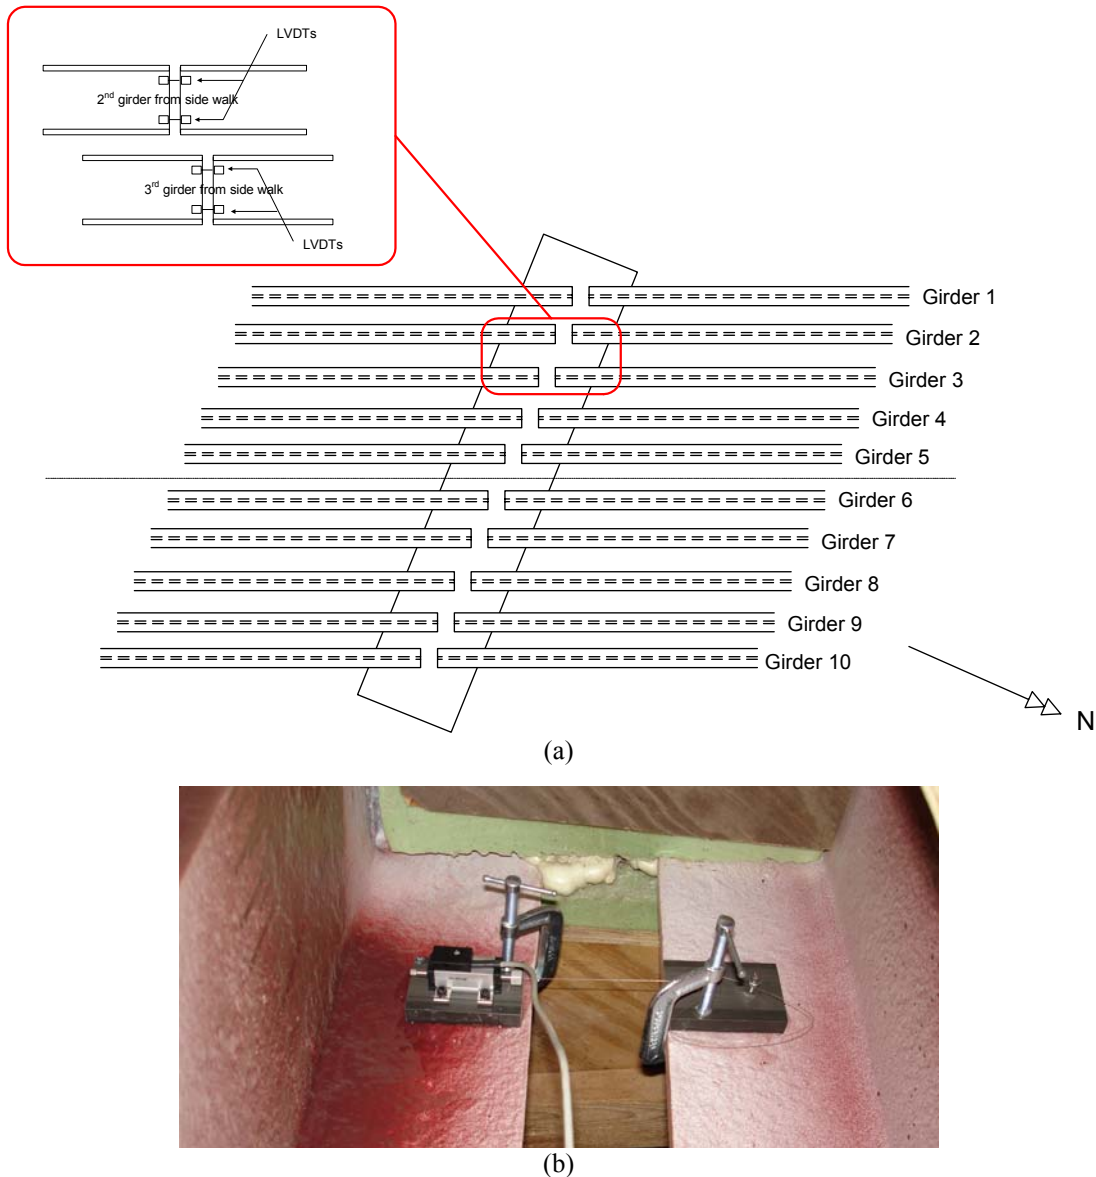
(a) Linear displacement transducers installation location and (b) LVDT mounted to the top of Girder 2's web
